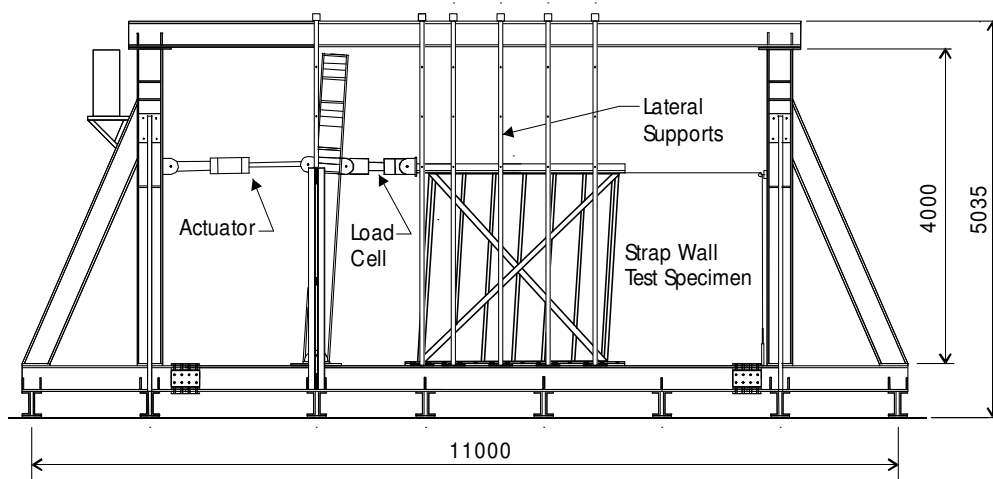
Schematic drawing of displaced strap braced wall specimen in test frame (mm).
